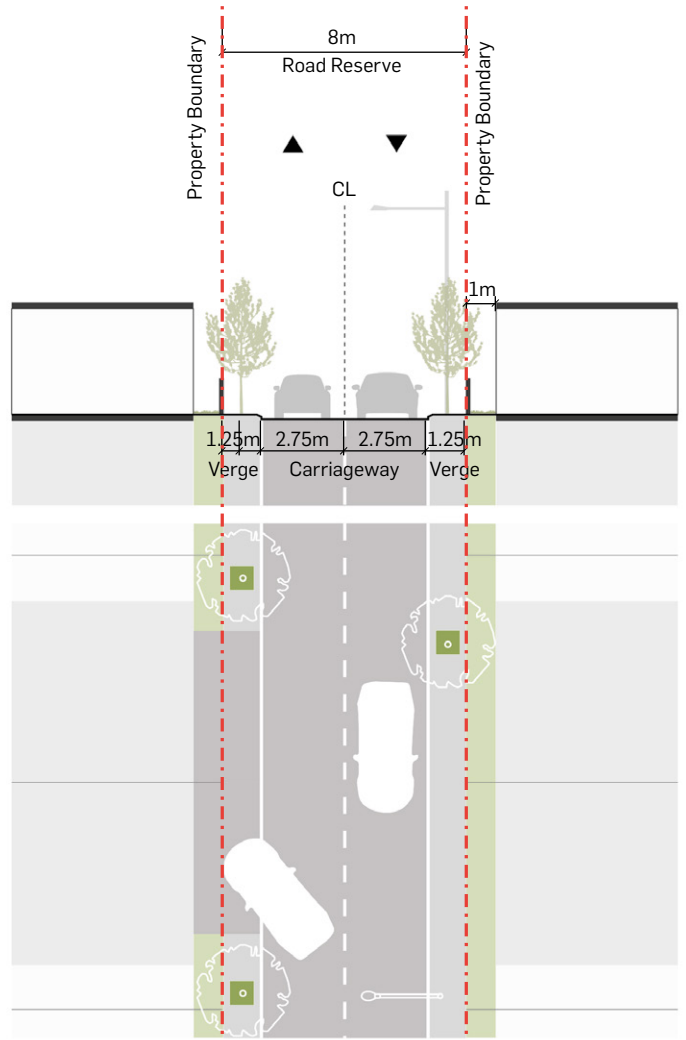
Indicative Street Section G-G' - Laneway - Type 8
